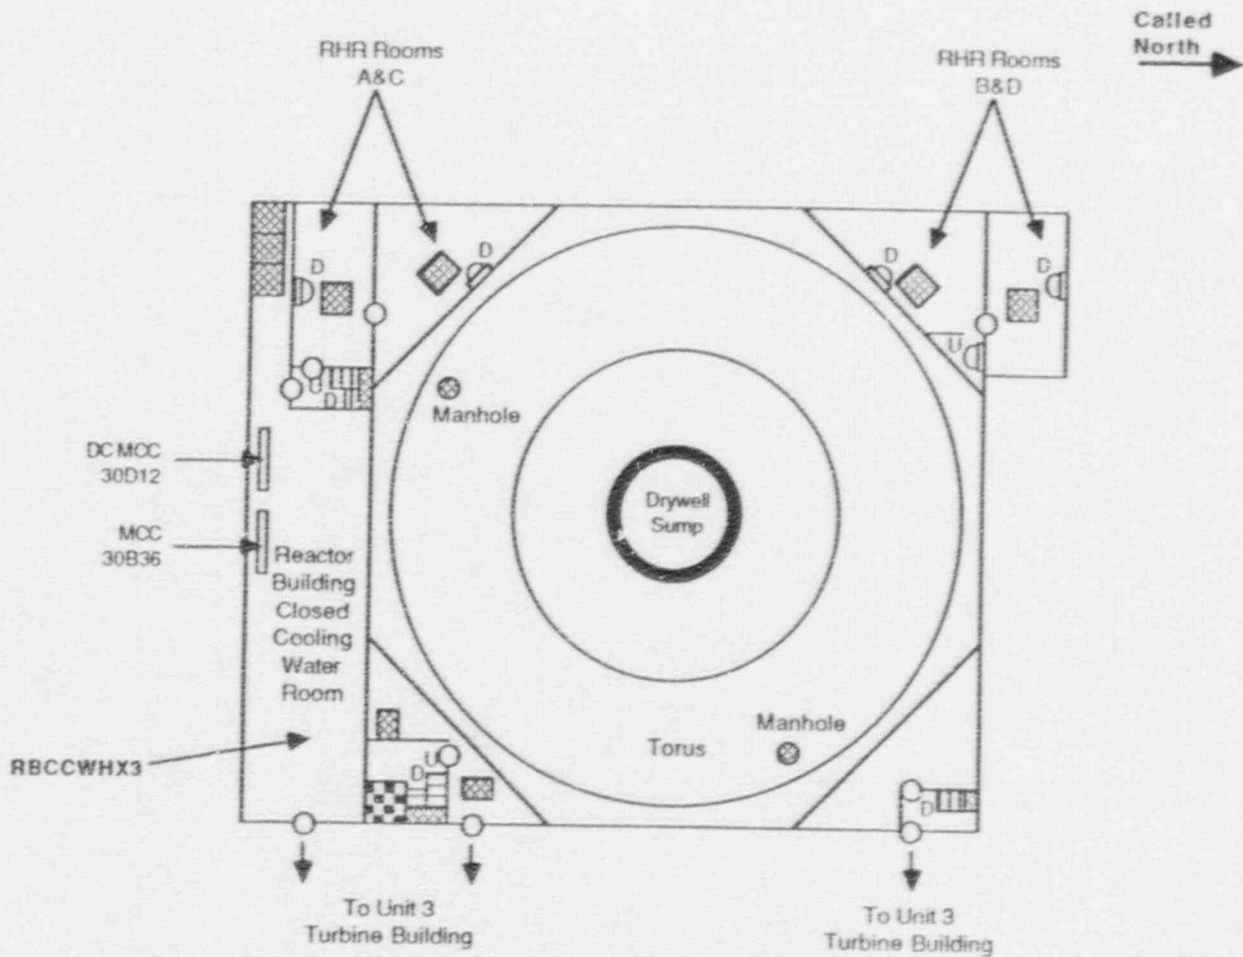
Peach Bottom 3 Reactor and Radwaste Building, Elevation 116'-0"
